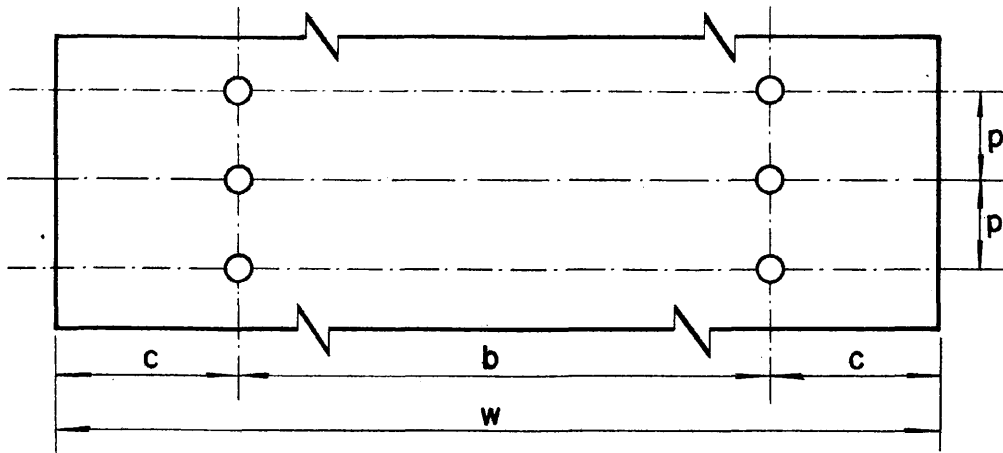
BUILT-UP PLATE (BOLTED OR RIVETED)
